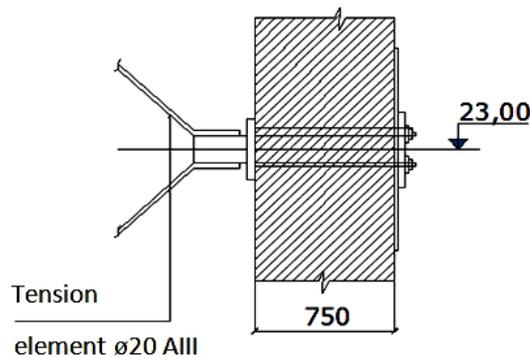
View of the wall of the drum construction with tensioning elements (Node A)
